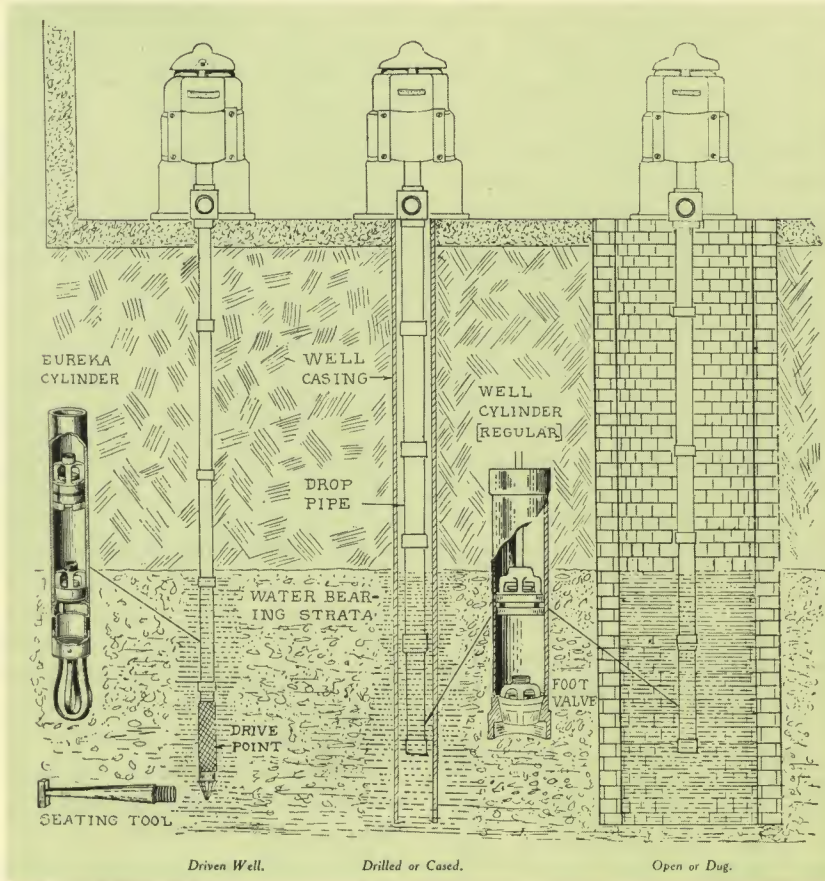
Deep wells are primarily of three types: (From left to right) 1—Driven well. 2—Drilled or cased well. 3—Open or dug well.
